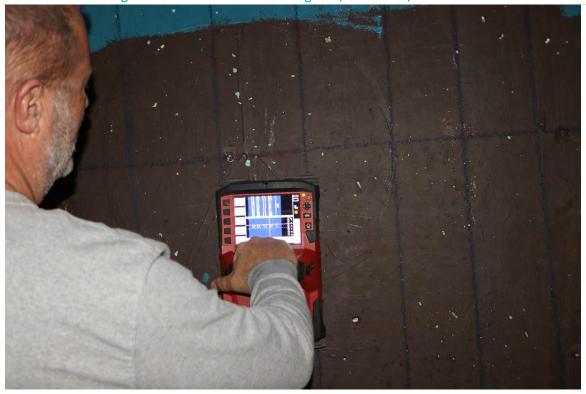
Detecting waffle wall steel reinforcement using GPR, East Wall, 1992 Retrofit – Pier Level (BA2-12)
